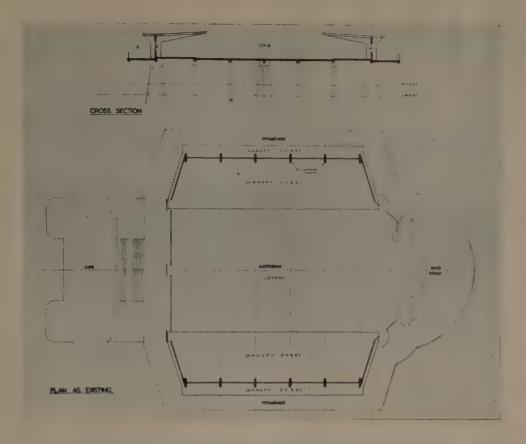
Plan and Cross Section of Pier Structure as Existing
